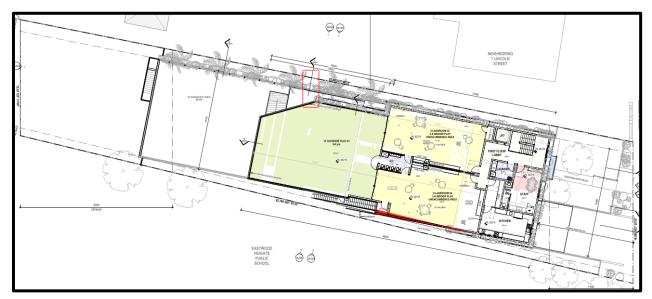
Extent of side setback encroachment shaded in red (First Floor Level). Source: From Plan DA103 (Revision C) dated 25 January 2023 as prepared by Liskowski Architects.
